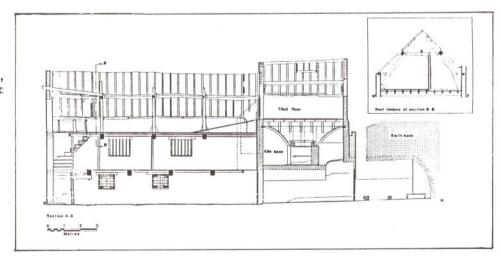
The Swan Inn, Ironbridge (IB86A). Main section through the malthouse and detail of the roof structure. (PY) (AJ, PY)
